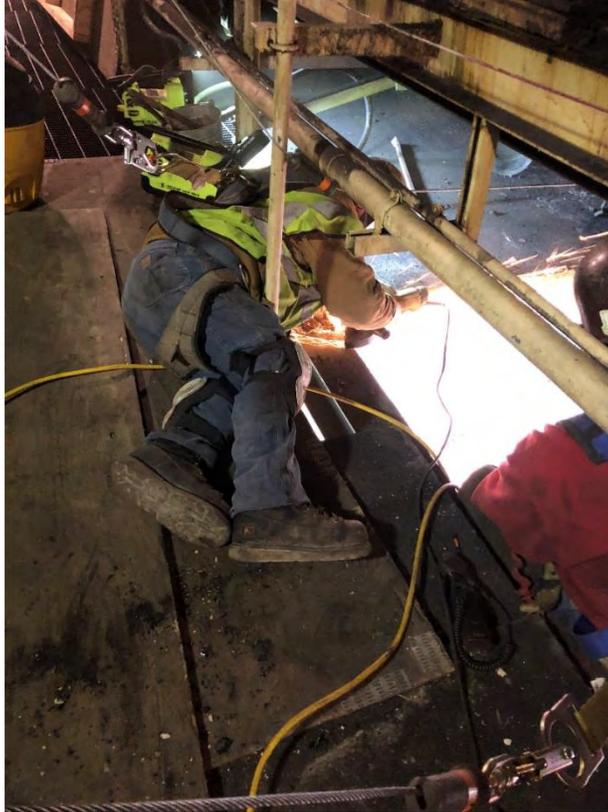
Employee grinding beneath F2 conveyor to install new panels.
